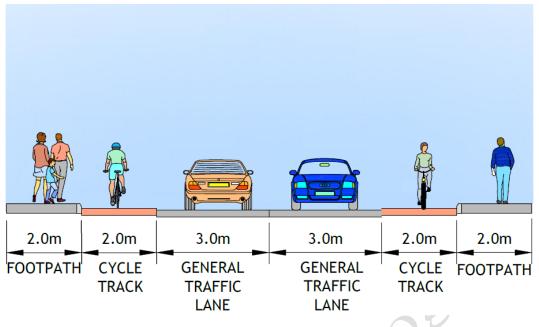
Cross-Section D-D (relevant to RG2 & RG4)
